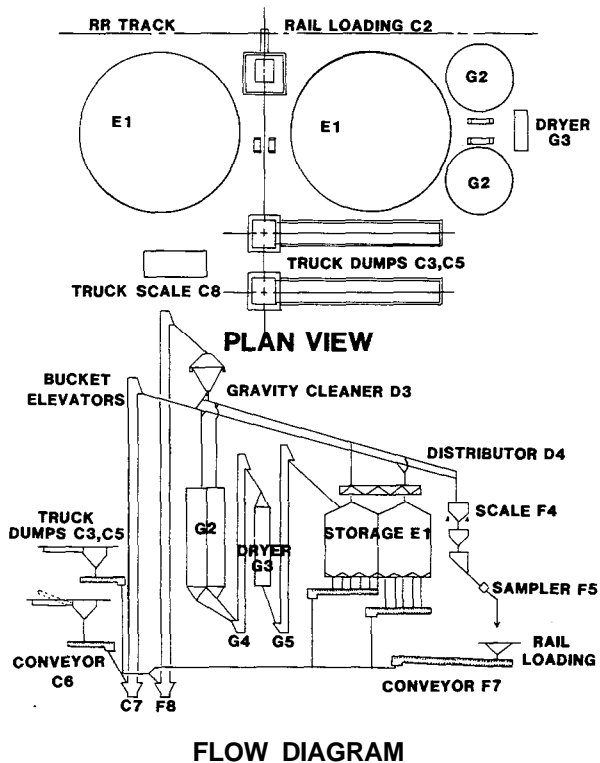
Flow diagram and plan view of 75-car loadout soybean facility.
